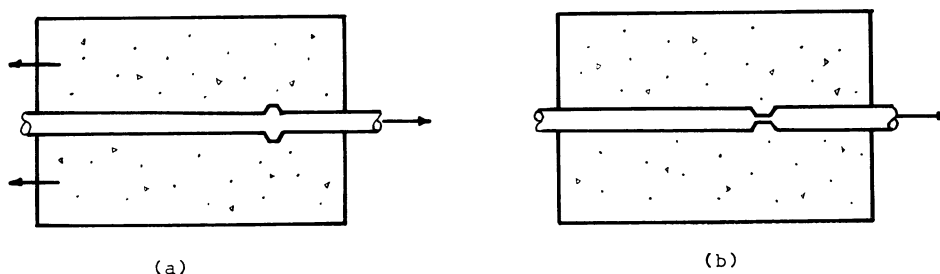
(a) Single-rib tests by Lutz; (b) single concrete key test by Rehm
